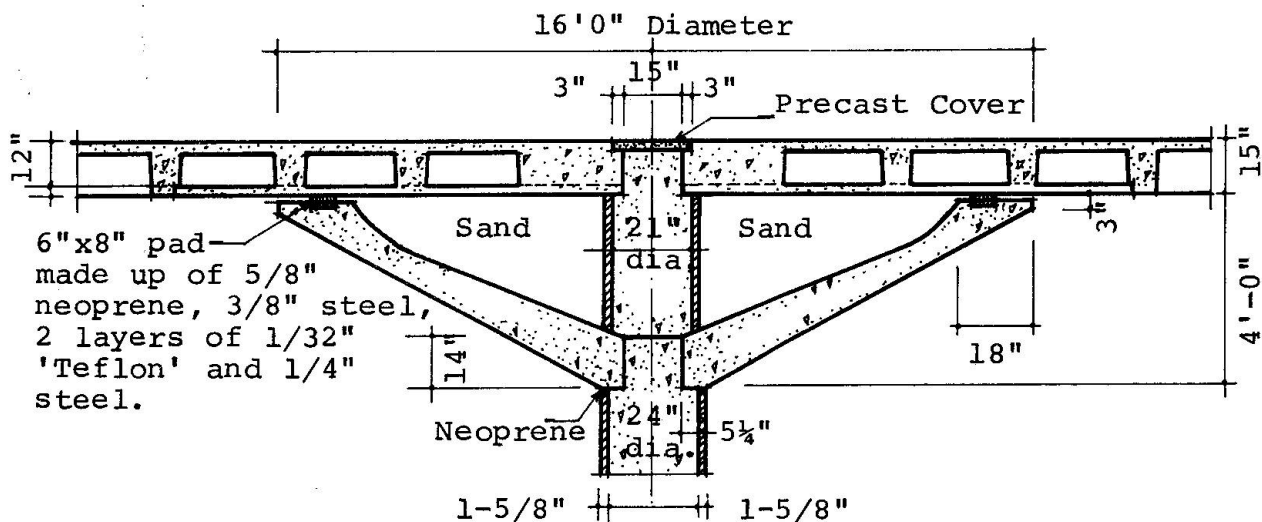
SECTION THROUGH WAFFLE SLAB AND COLUMN CAPITAL
